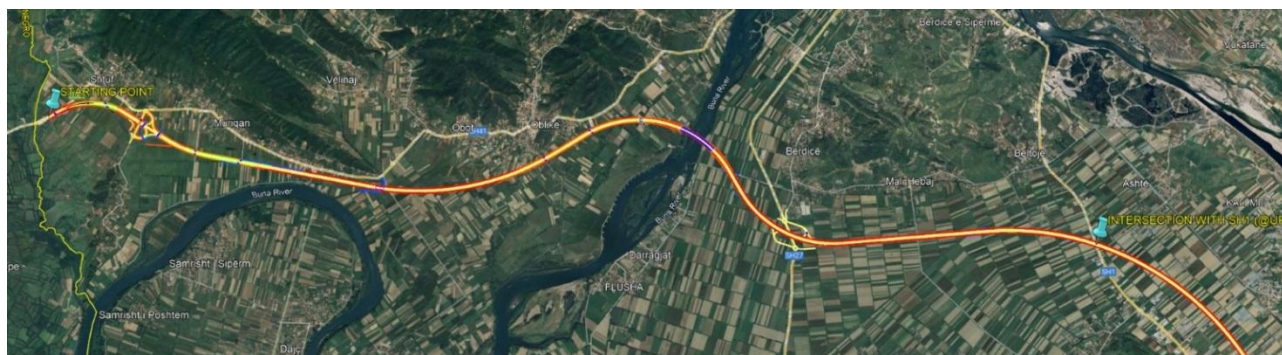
General layout of the first sub-section (Ch. 0+000 – Ch. 13+550)
